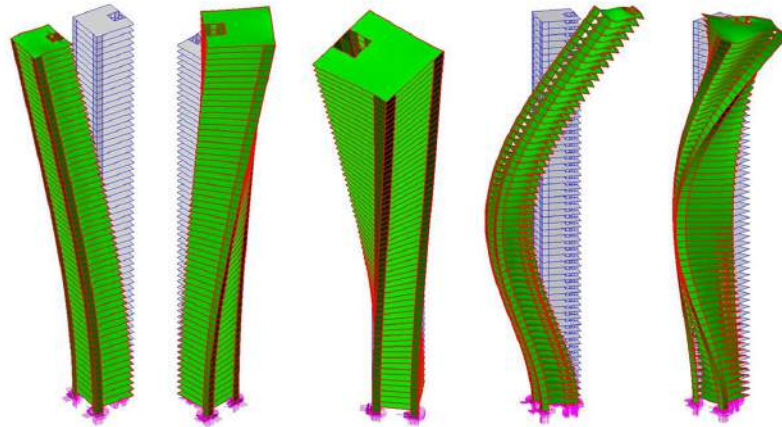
Not regular floor plan: mode shapes N. 1-5.
